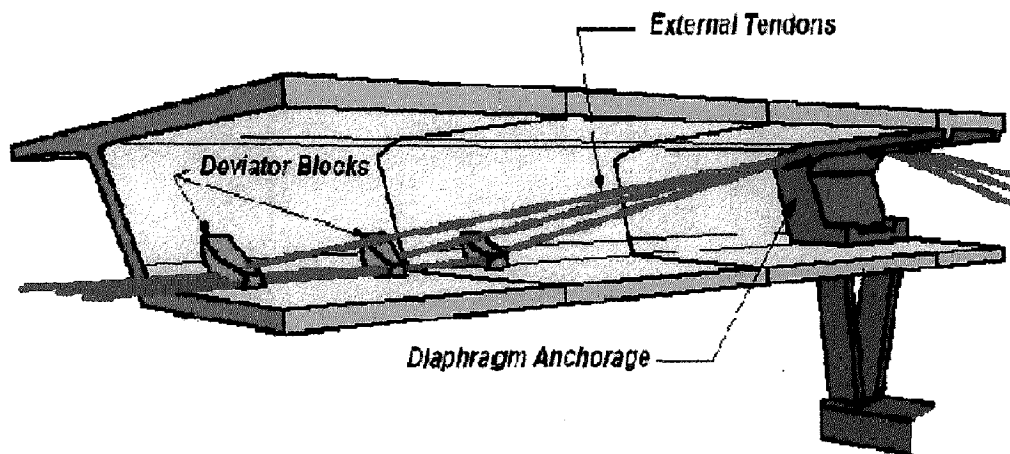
Typical layout of an externally post-tensioned box girder bridge
